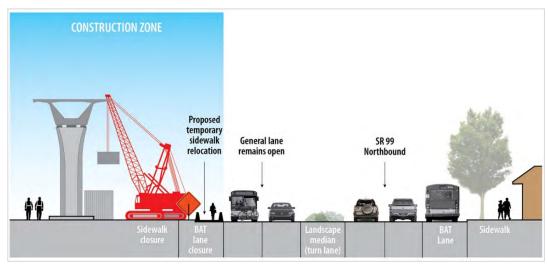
Construction of Elevated Guideway on Side of SR 99
